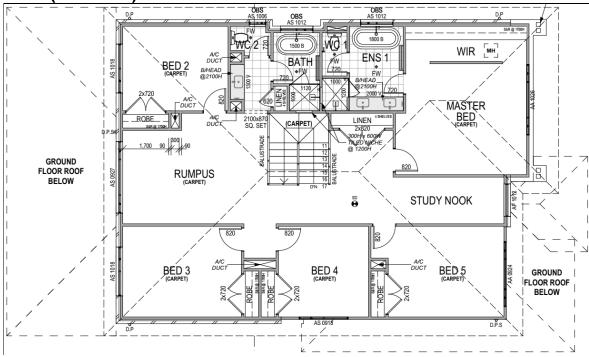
Extract of proposed Lot 2 first floor. Source: Hall & Hart Homes, 2020
